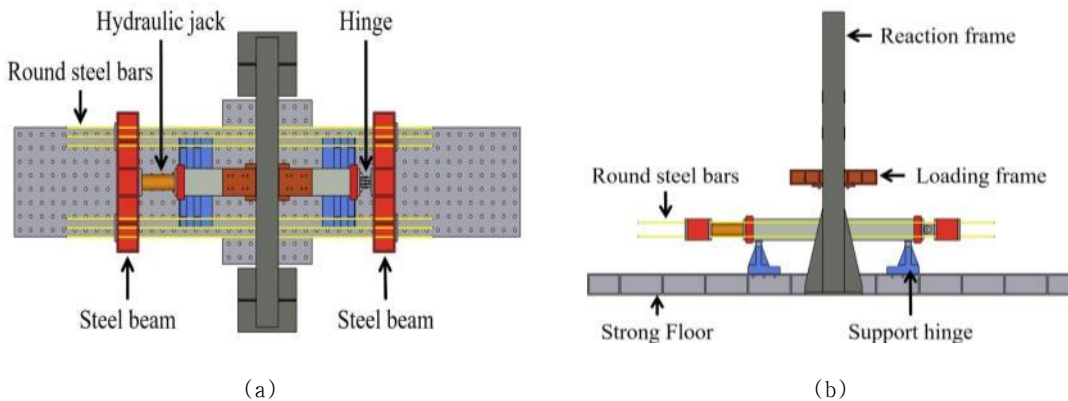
Test Setup for Specimens: (a) Top View, (b) Side View
